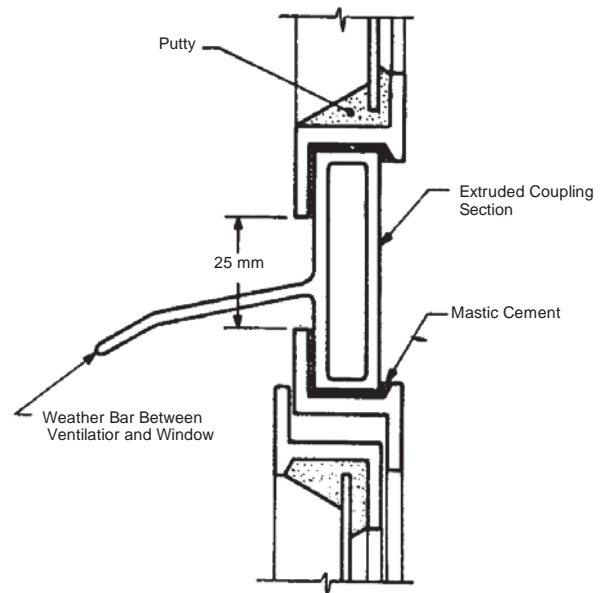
Coupling Section Extruded having Weather Bar Fitted with Ventilators on top of Windows
